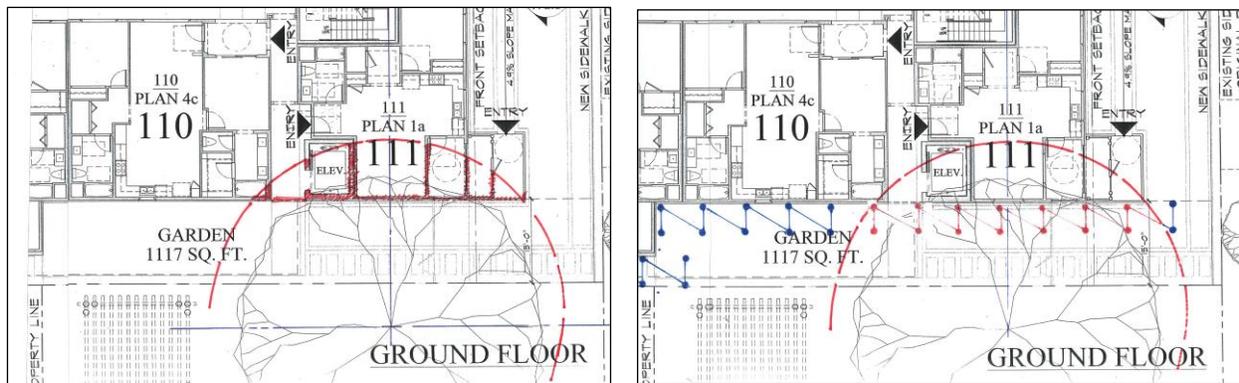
& 8b: Mandatory Tree Protection Plan and Foundation Wall Interferences
